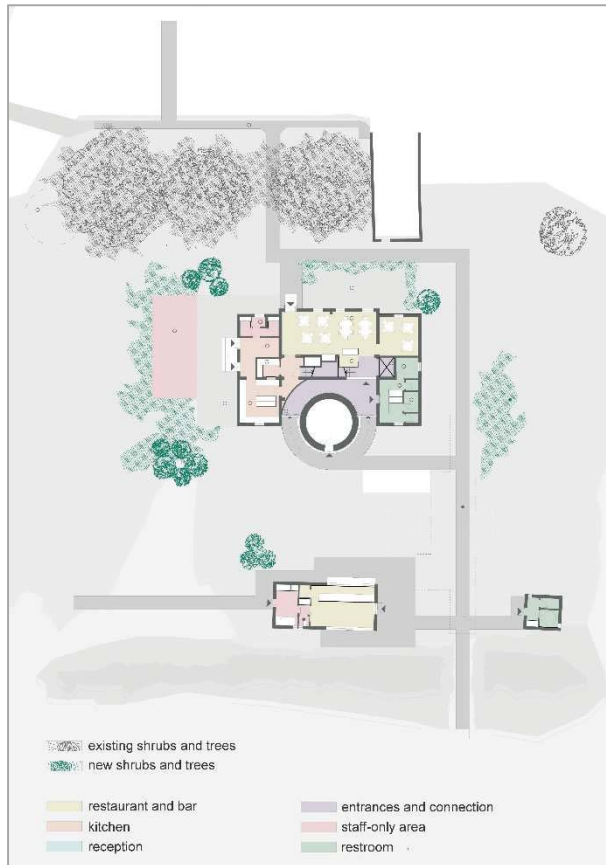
Goro Lighthouse: reuse general plan, ground floor
